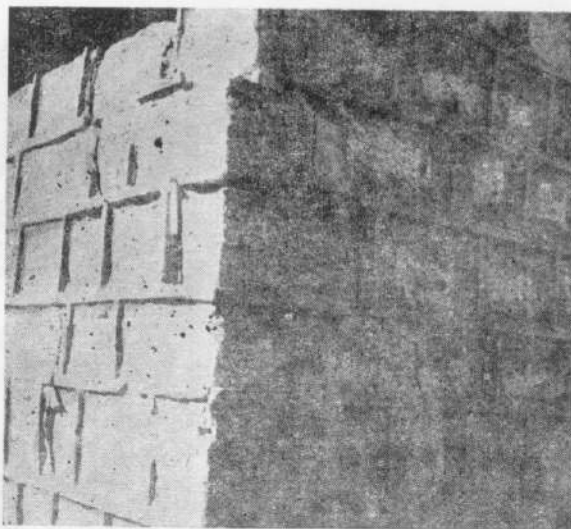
Reopening of pre-existing cracks in P.W.D. rest house at Tapri village. Cement pointing along mortar joints had fallen.
